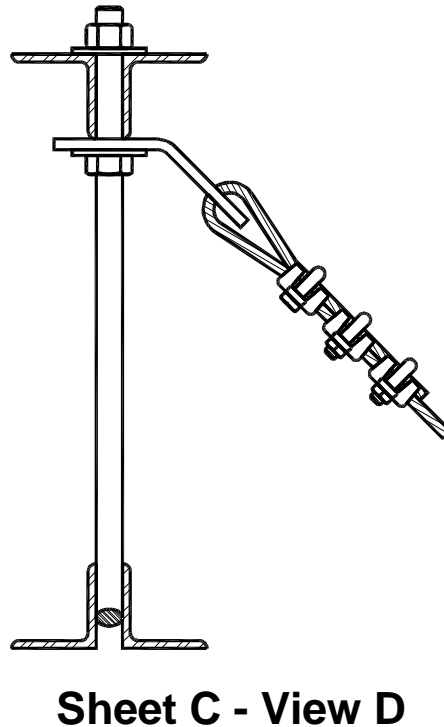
; Attaching KSUA Brackets to Un-Braced Open Web Steel Joists
